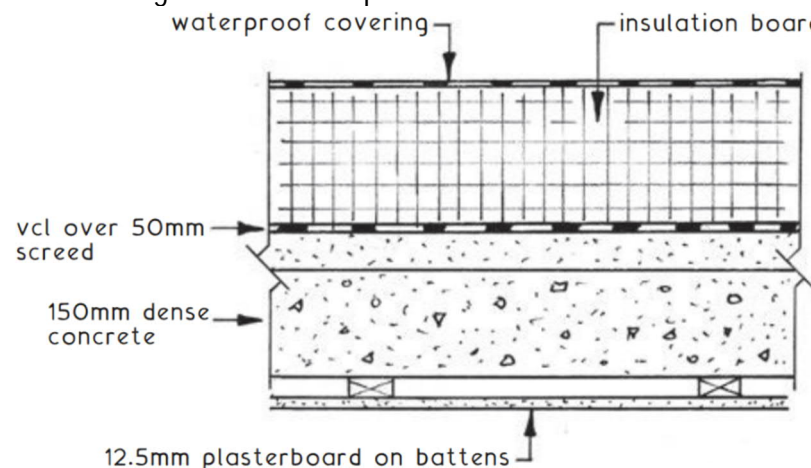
Typical concrete roof structure (Chudley & Greeno, 2014, p. 571)
